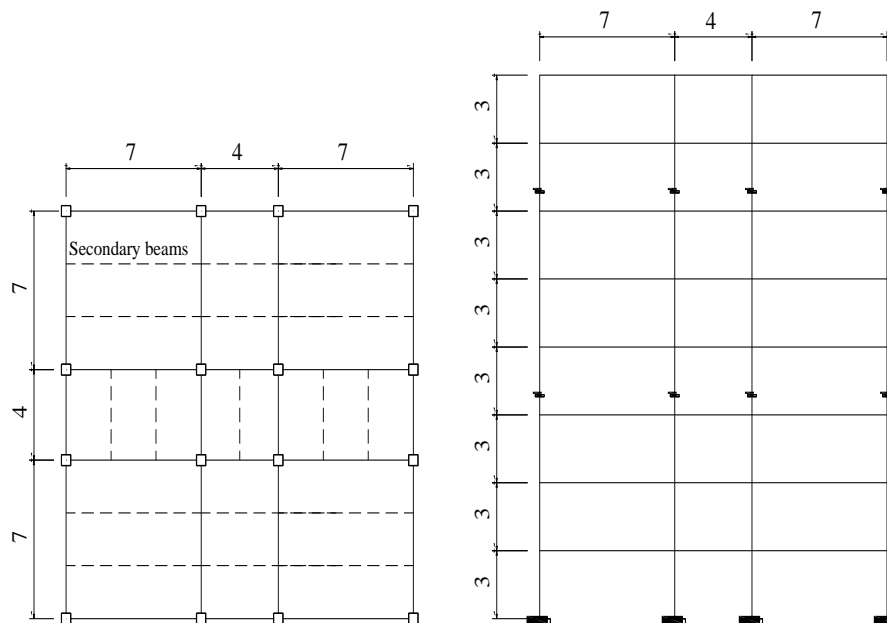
Plan and elevation view of the 8-story building (dimensions in meters)
